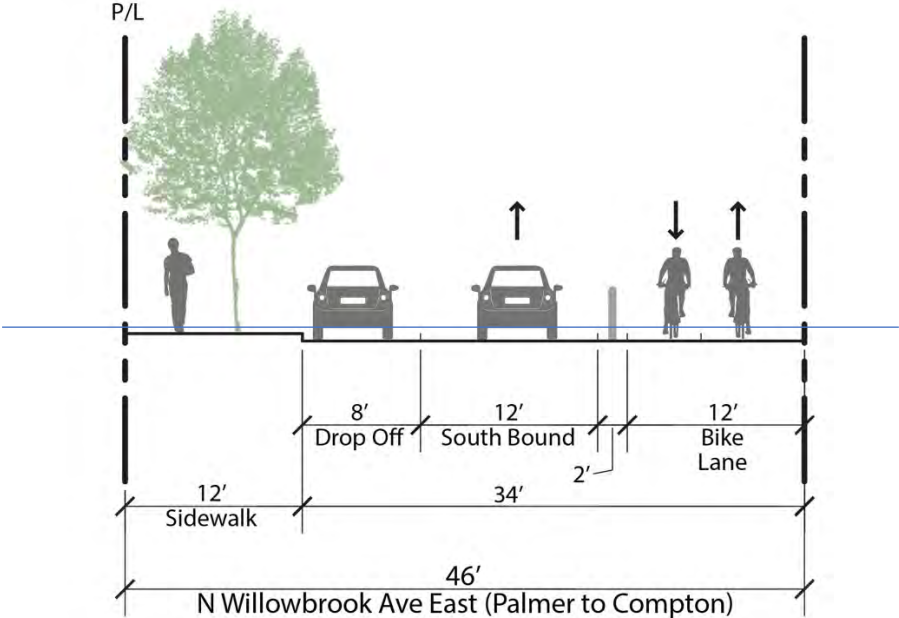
North Willowbrook Avenue East (Palmer to Compton) Typical Cross-Section.
